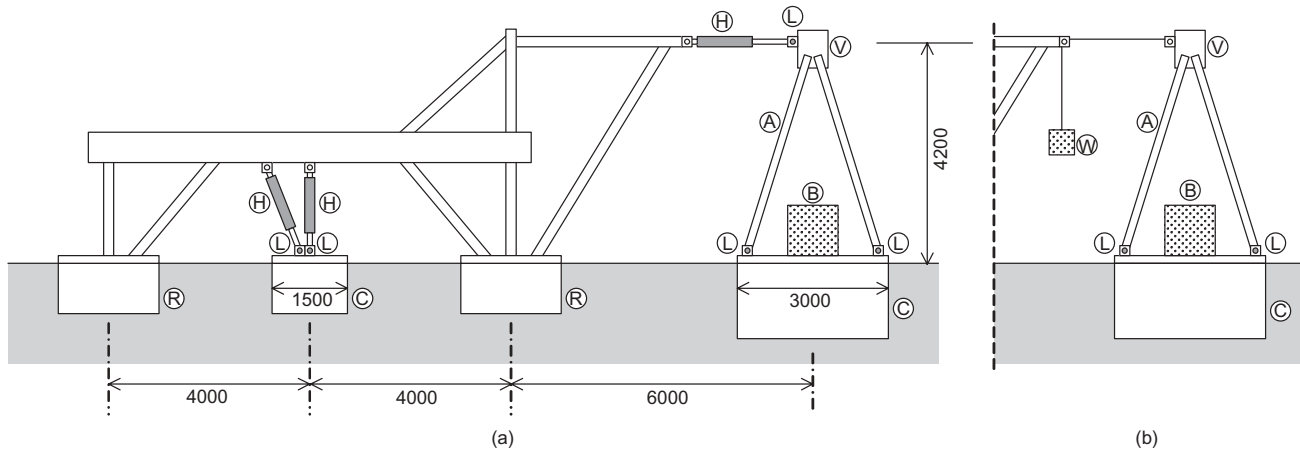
Outline of field testing equipment, dimensions in mm (water level and displacement reference frames not shown): (a) arrangement for jacking tests on 1.5 m and 3.0 m caissons; (b) alternative arrangement during SEMV tests. A, A-frame; B, concrete block; C, caissons; H, hydraulic jacks; L, load cells; R, foundations of reaction frame; V, SEMV; W, weight providing offset load for SEMV tests
